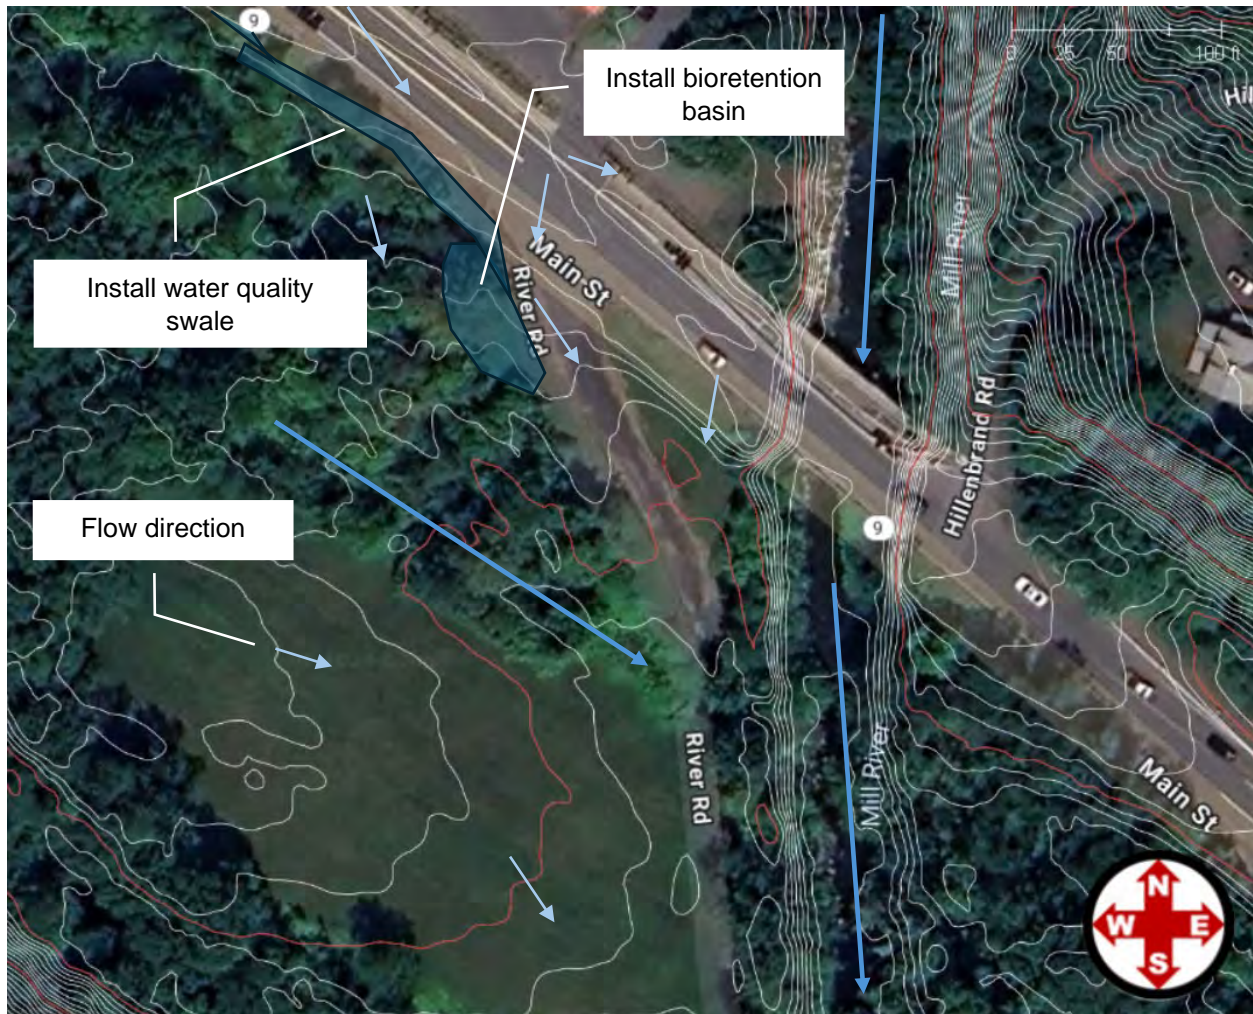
A-3: Proposed swale and bioretention basin at River Road and Main Street
